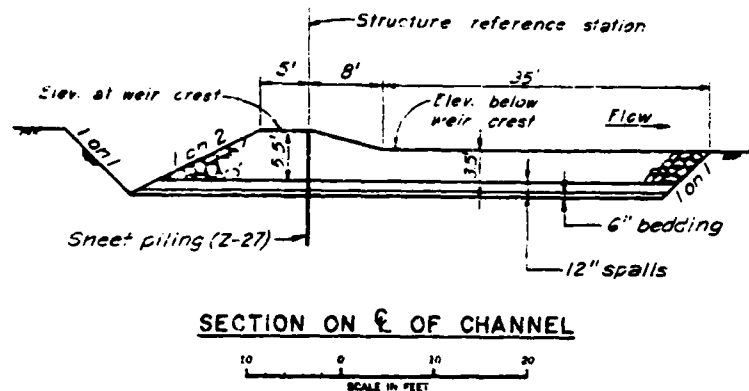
Mud Creek at Lawrence, Kans. Longitudinal cross section of sheet-piling and rock sill.
